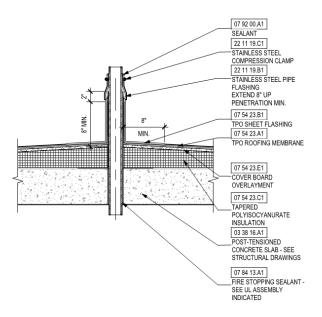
Typical Roof Penetration Detail. The TPO roofing membrane, cover board overlayment, and polyisocyanurate insulation can be seen in this section.
